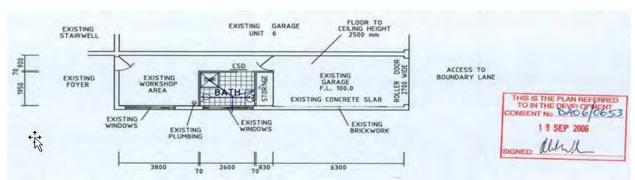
Approved Unit 5 Garage Level floor plan DA06/0653
